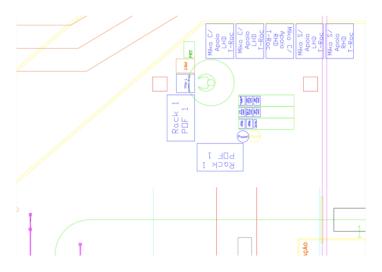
Future Layout of the ground floor MIKO 1 workstation.
